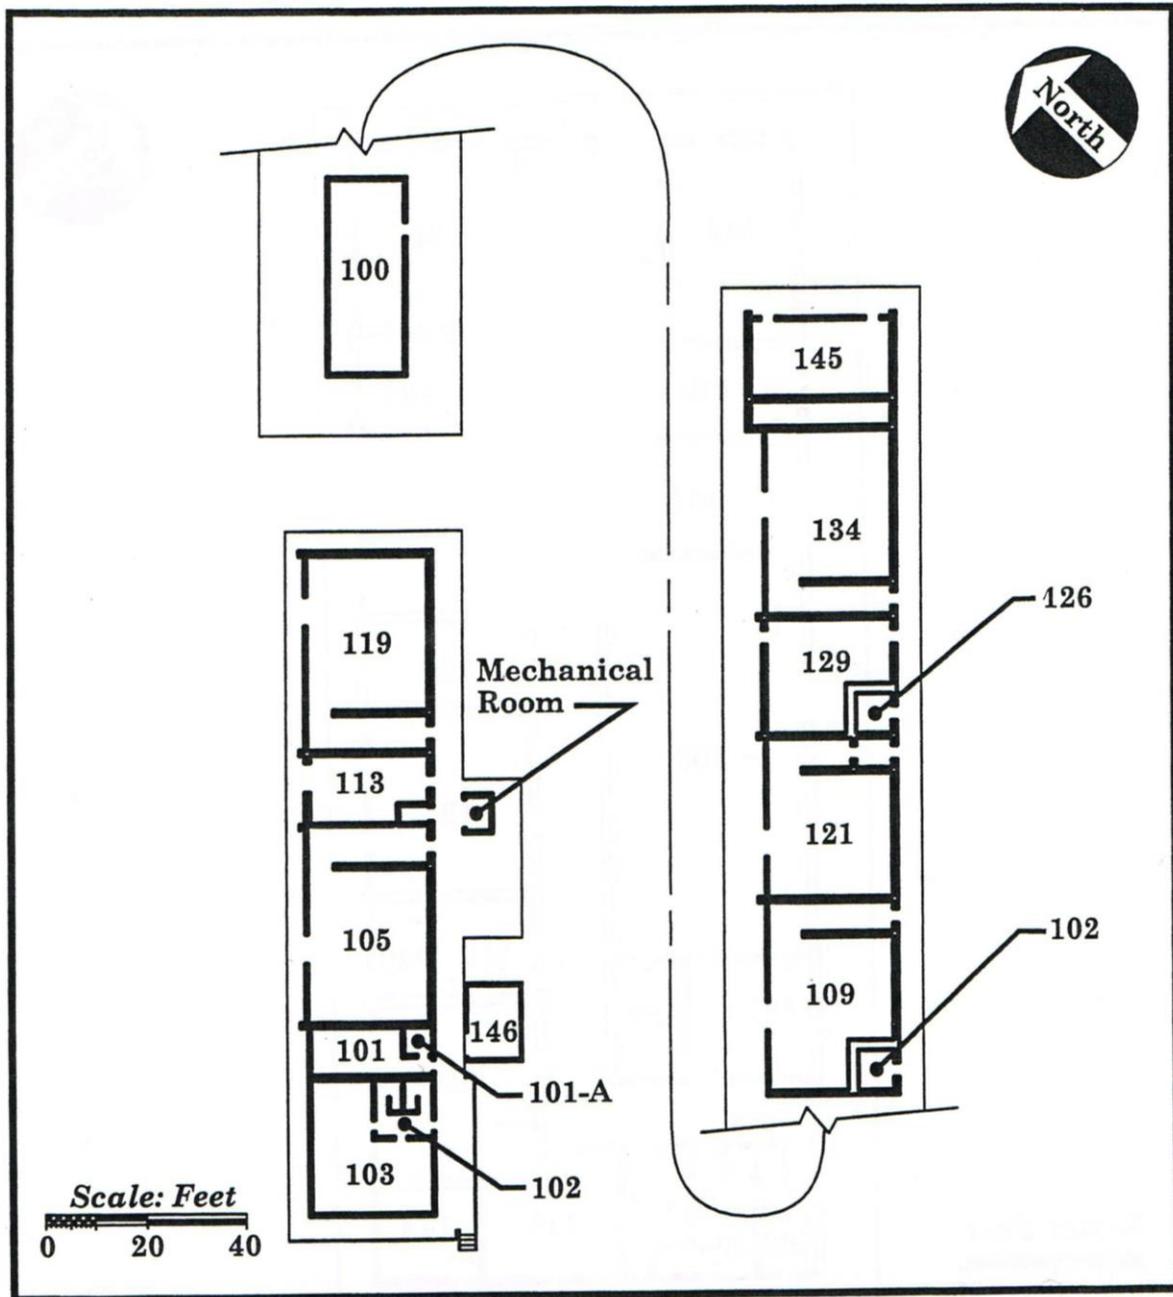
Building 806, Facility Floor Plan, 1997. LLNL Archives. (Figure A-2)
